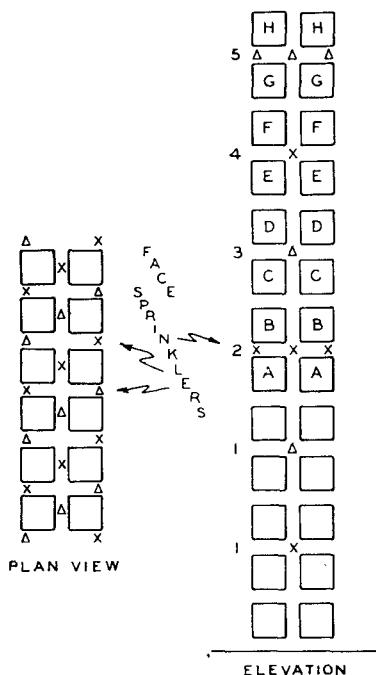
In-Rack Sprinkler Arrangement, Class I, II or III Commodity, Height of Storage over 25 Feet
